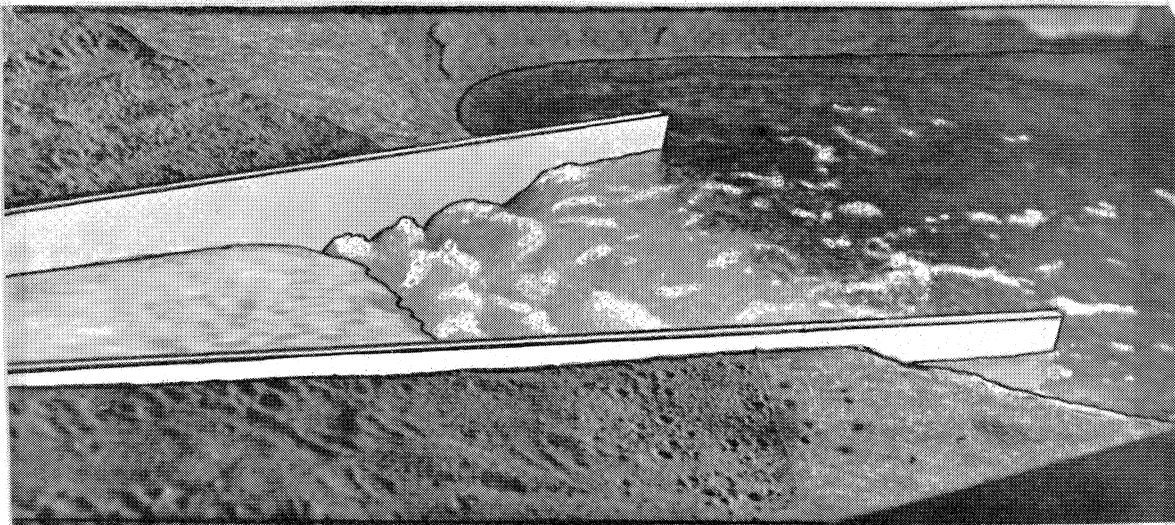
Model of Outlet Structure with Straight Diverging Walls
